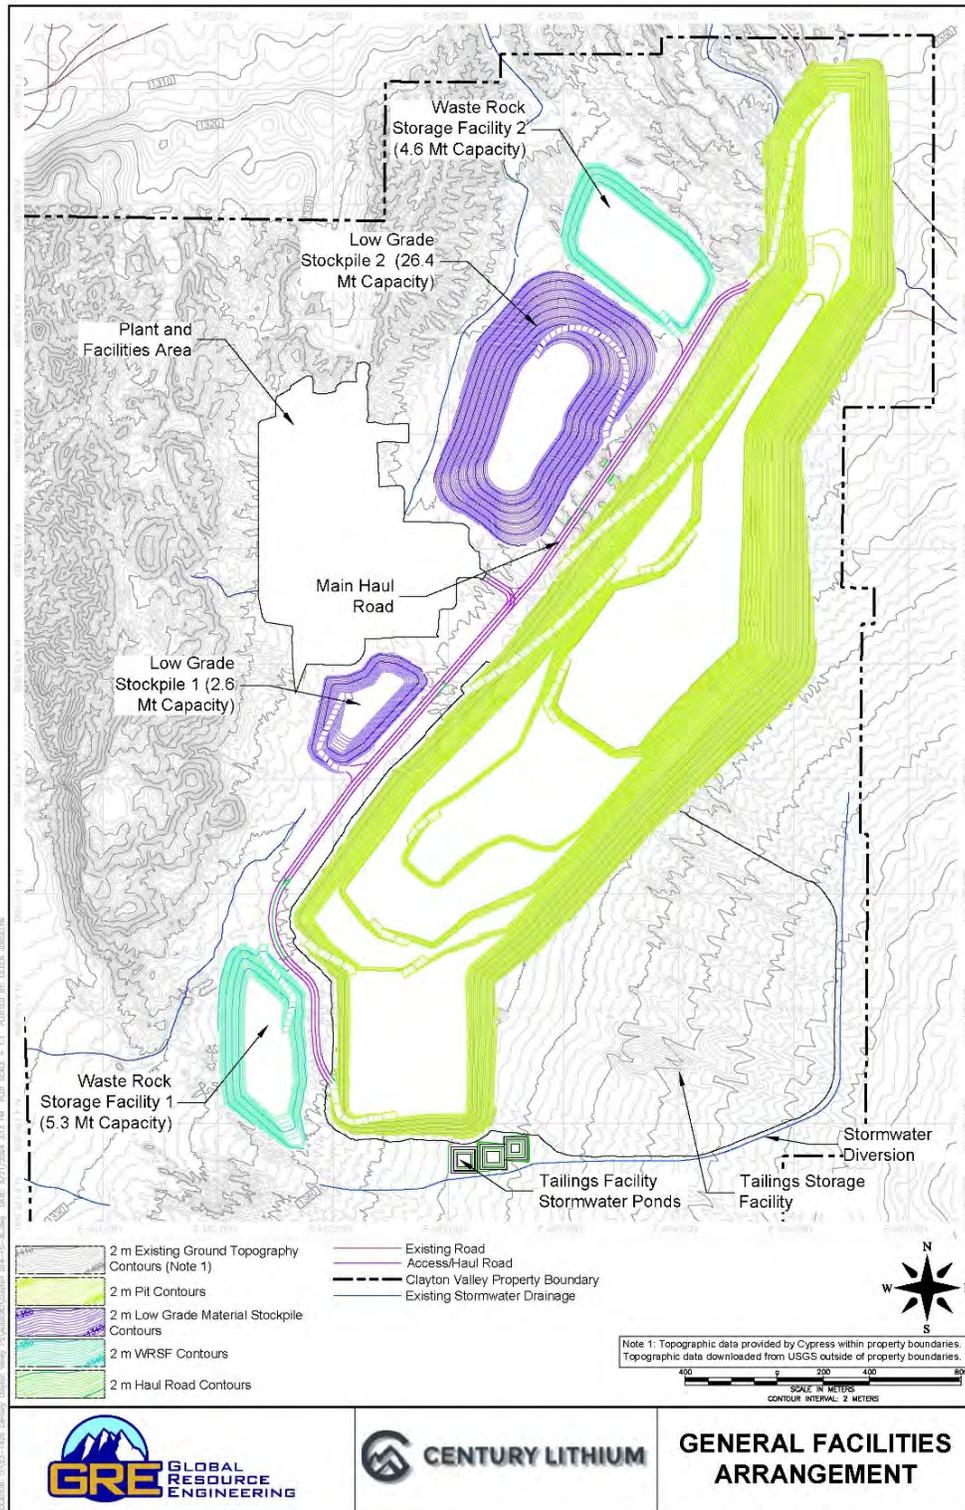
Mining-Related General Facilities Arrangement (Source: GRE, 2024)
